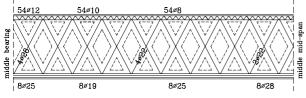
Longitudinal disposition of the border main girders reinforcement in the middle field
